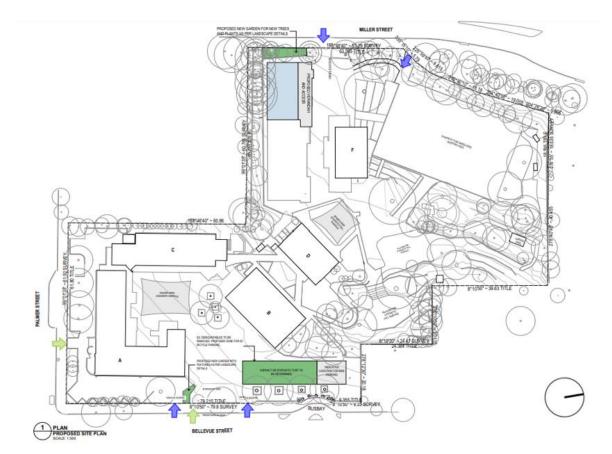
Proposed Scope of Works (Source: Fulton Trotter Architects, Proposed Site Plan (Rev P6))
